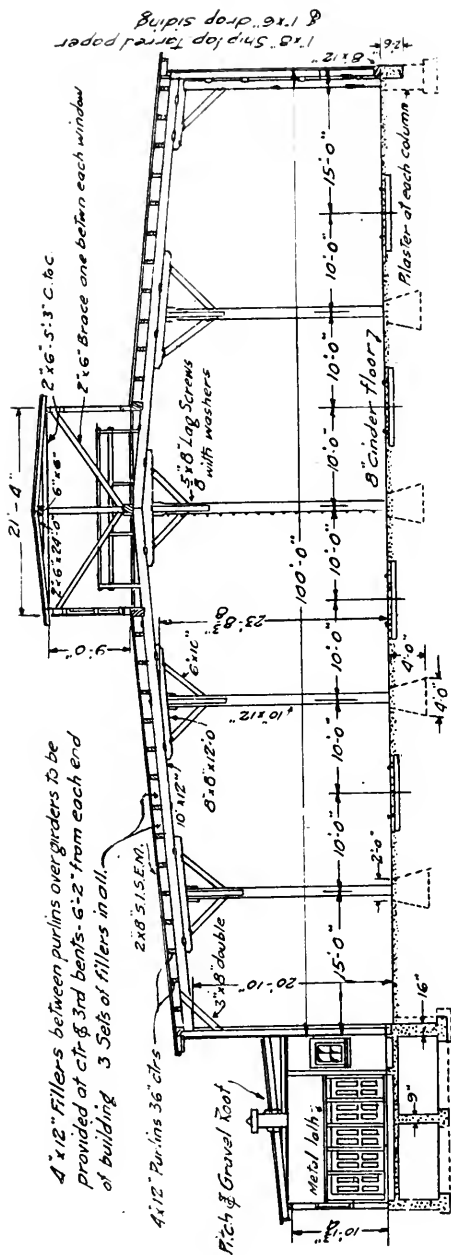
CROSS-SECTION OF CAR REPAIR SHED, 100 FT. BY 250 FT., NORTHERN PACIFIC RAILWAY, WATERTOWN, NORTH DAKOTA.
